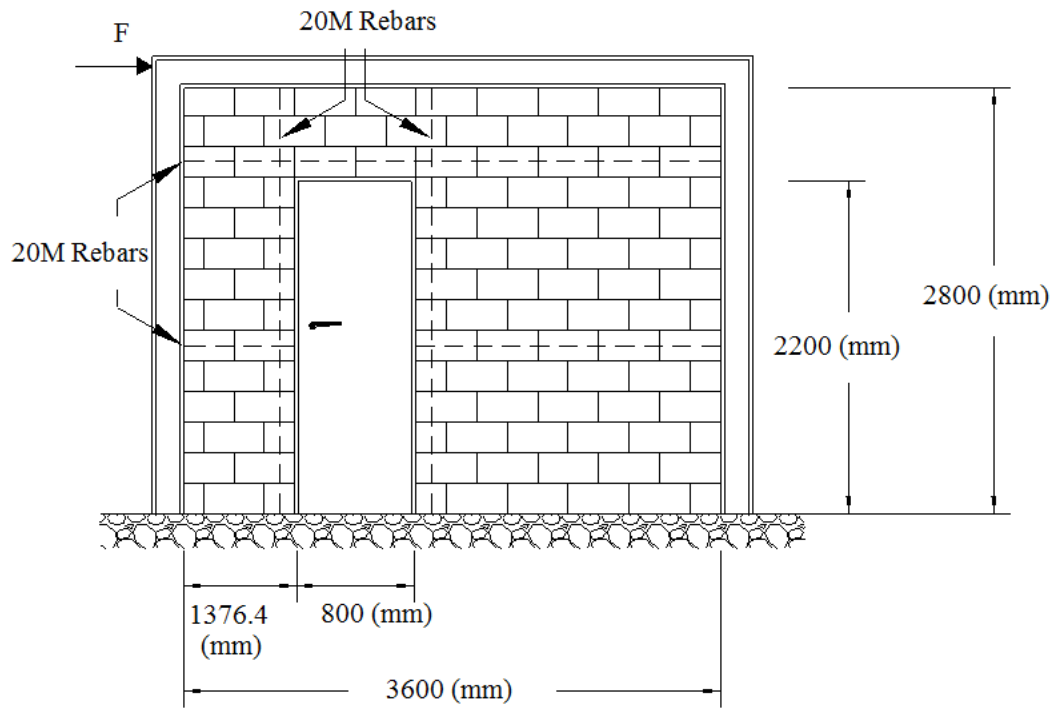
14. Reinforced Infill Wall Case With Opening Offset Toward The Loading (NTS)
